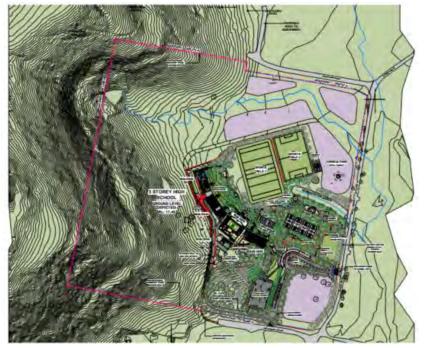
Overall Site Context Plan (Source: EJE Architecture)
